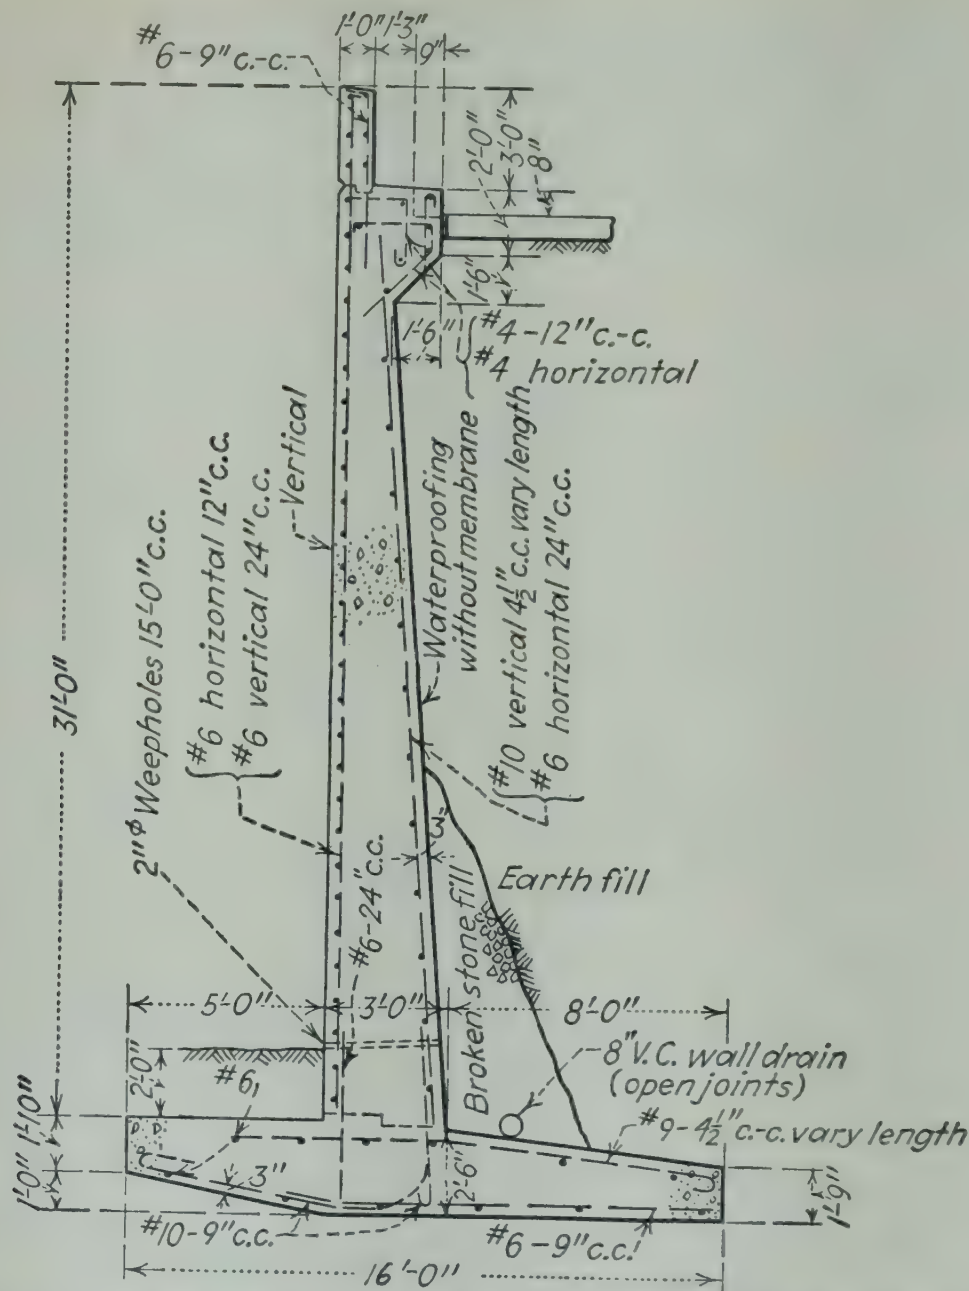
Retaining wall designed for the connection to the Harlem River Speedway, Highbridge Park, New York City.
